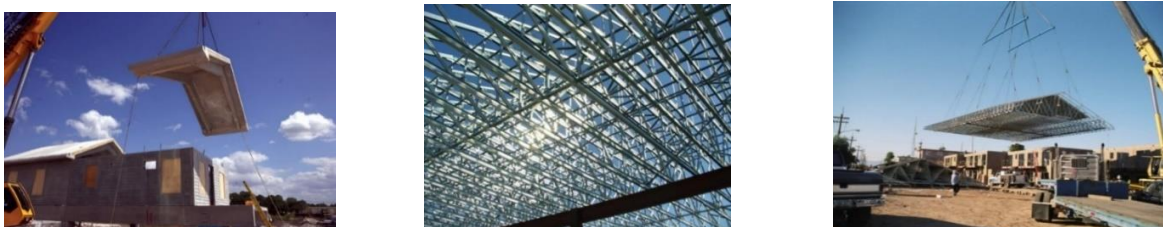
An example of pitched concrete roof (Icfmag, 2022).
